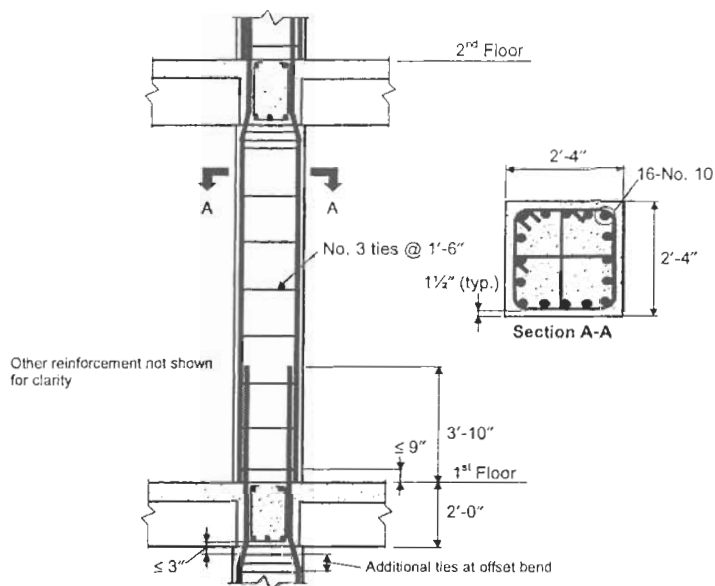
Reinforcement Details for Column C4 Supporting the 2<sup>nd</sup> Floor Level (SDC A)
